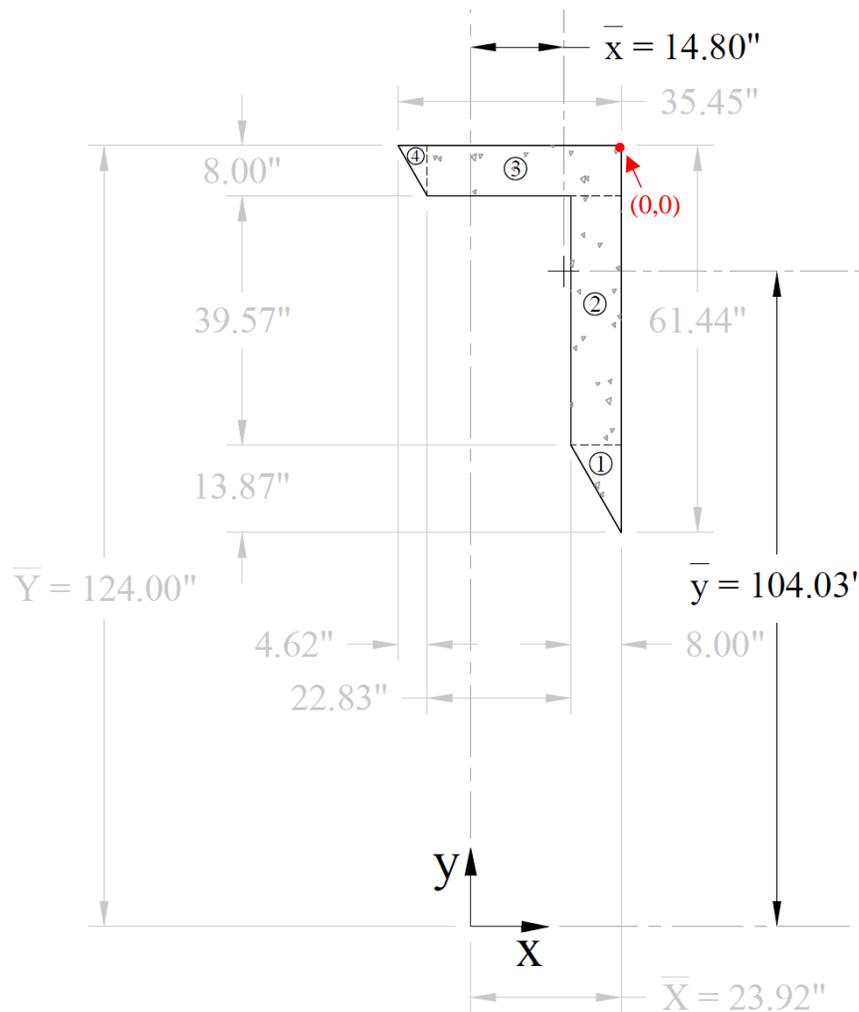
Cracked Concrete Wall Section Centroid Calculations
